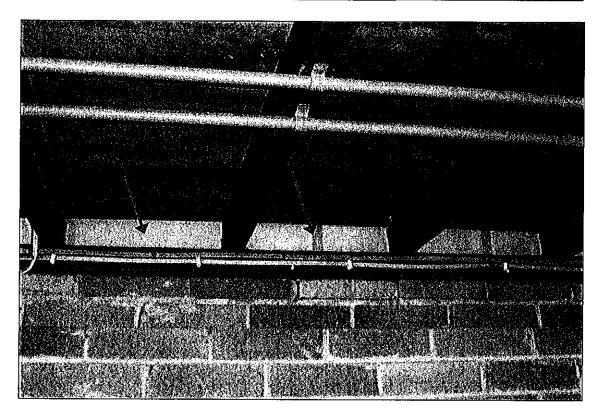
External/Rear Hardiplank Asbestos Cement Wall Lining
